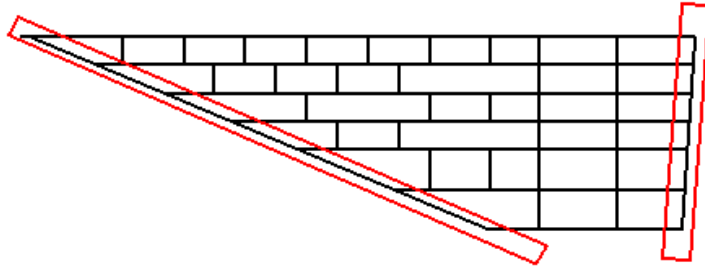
Recommended staggered framing arrangements for straight skewed bridges with only one bearing line having a substantial skew angle.
